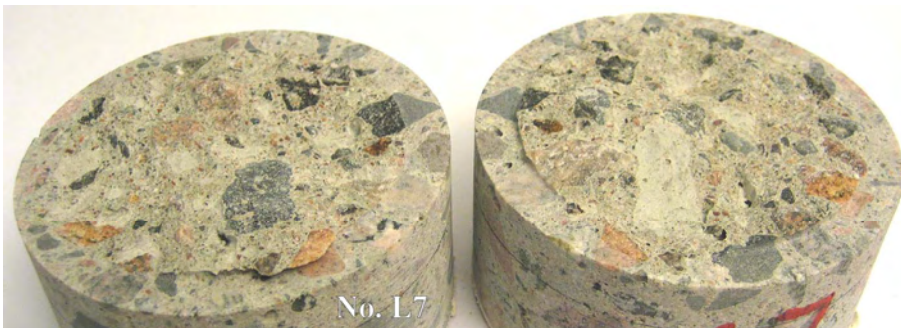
Photograph showing the failure surface for test No. L7 after fatigue test.
